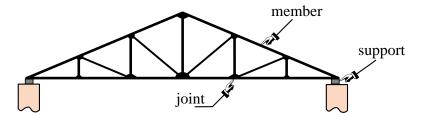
An actual plane truss structure. That shown is typical of a roof truss used in building construction.
